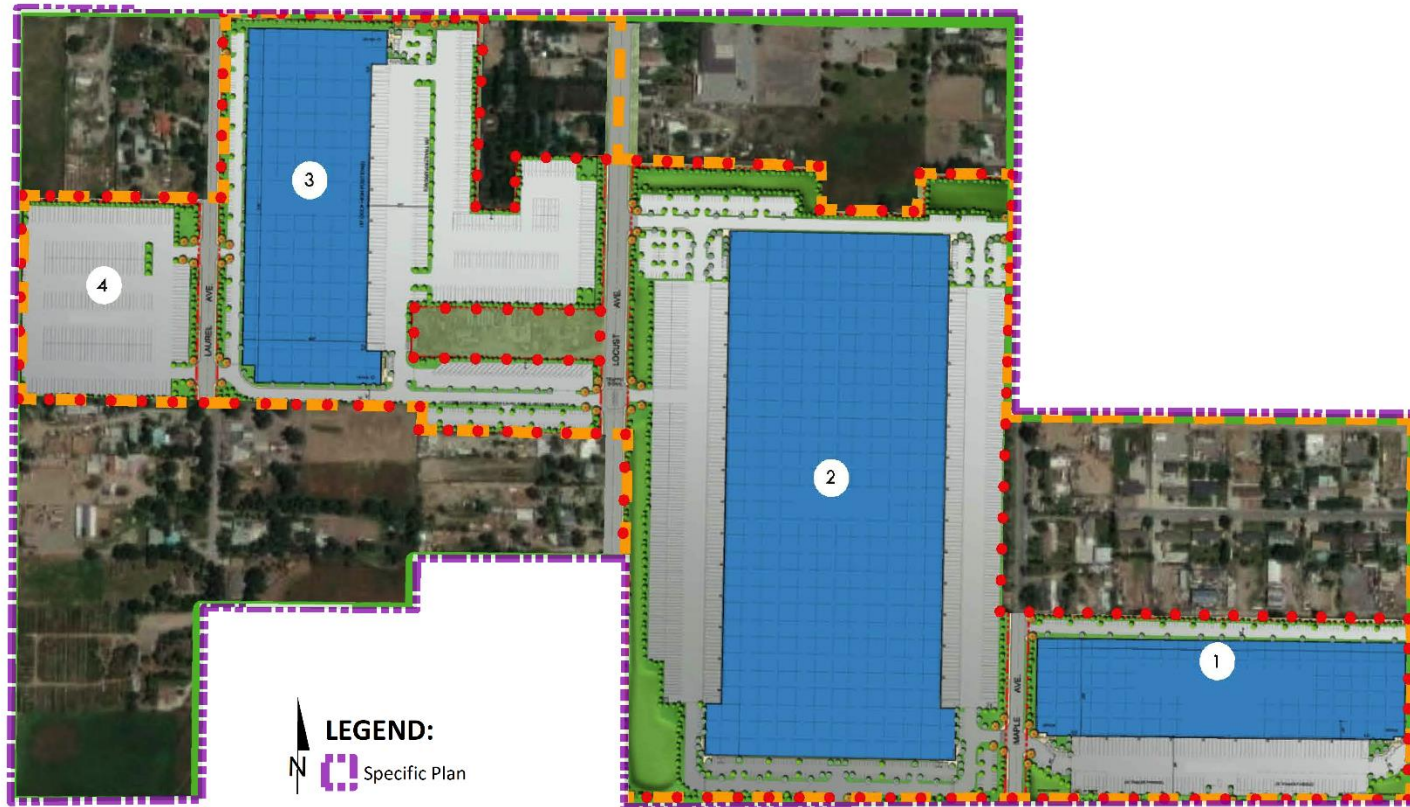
D: SPECIFIC PLAN (SP) SITE PLAN
